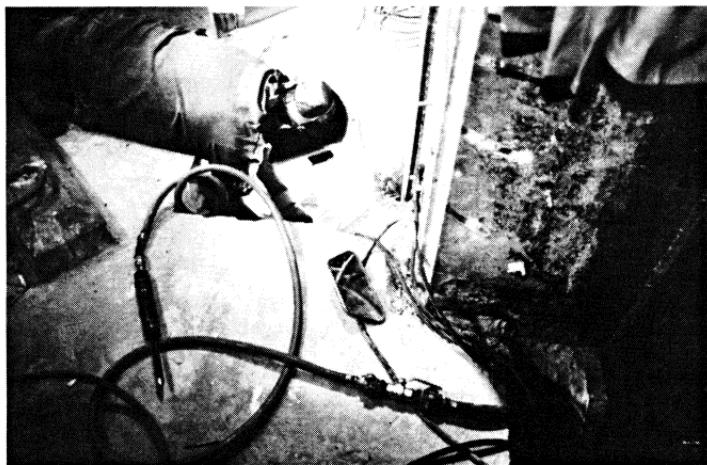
Welding of steel reinforcing plates to existing column.
